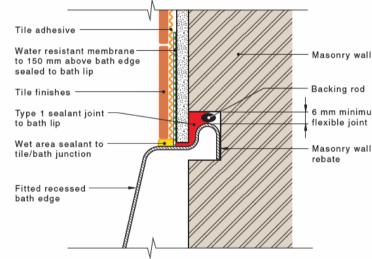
(A) — Bath with no shower over it — Fitted bath — Masonry wall
